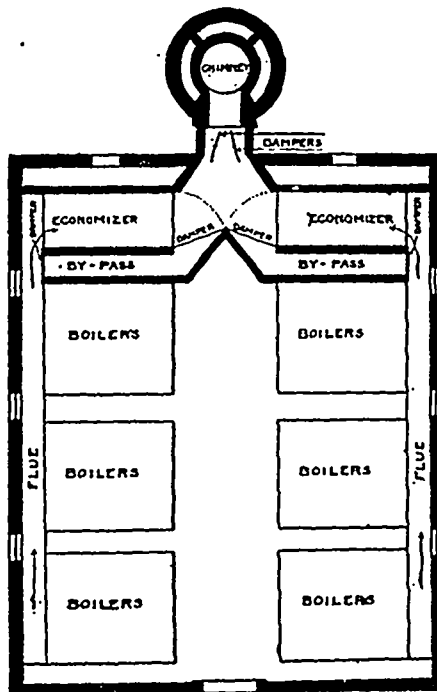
2400 H.P., BOILER PLANT EQUIPPED WITH CHIMNEY DRAFT.
